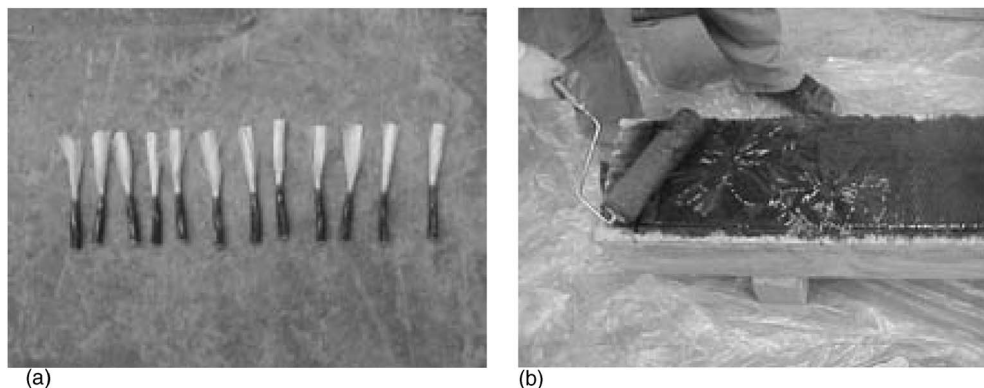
Beam strengthened with bonded CFRP fabrics and using anchor spikes: (a) Half saturated dry glass fibers; (b) final shape of anchor spikes
